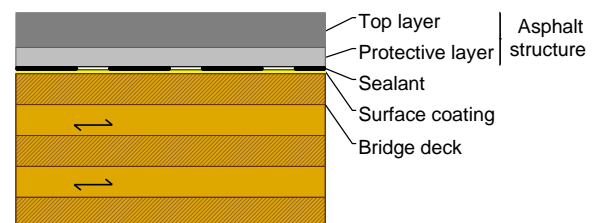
Sketch of a system with a bonded shear connection between asphalt and bridge deck
